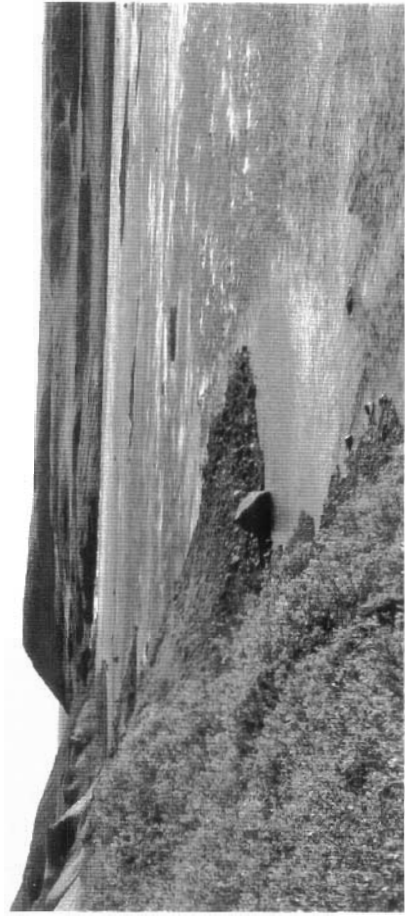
July 2002.* Location of Proposed marine breakwater and docking facility at Kugluktuk, Nunavut. Note: Access road and staging area under construction.
